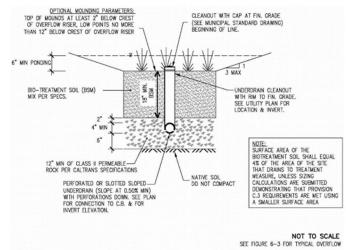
Bioretention Area Cross-Section (Source: SCVURPP C.3 Stormwater Handbook, June 2016)
